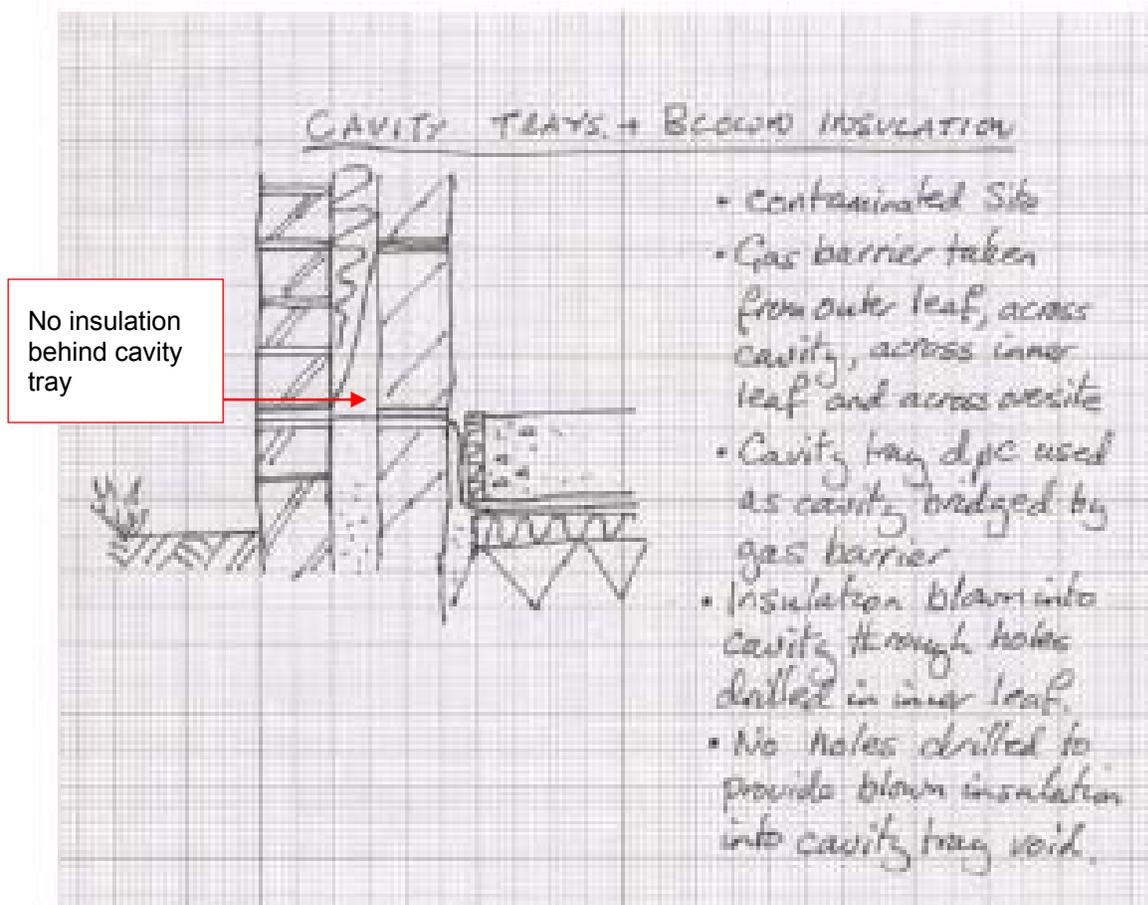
Gas barrier and cavity tray at ground floor/external wall junction.
